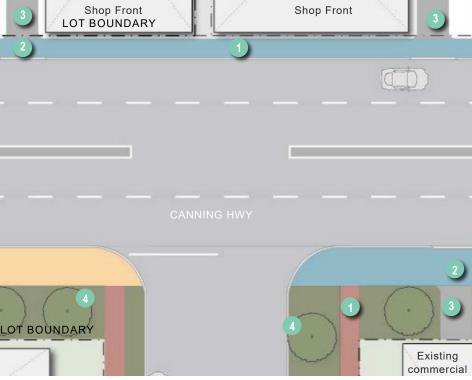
Typical Town Centre Precinct streetscape illustrating proposed footpath and crossover materials.
